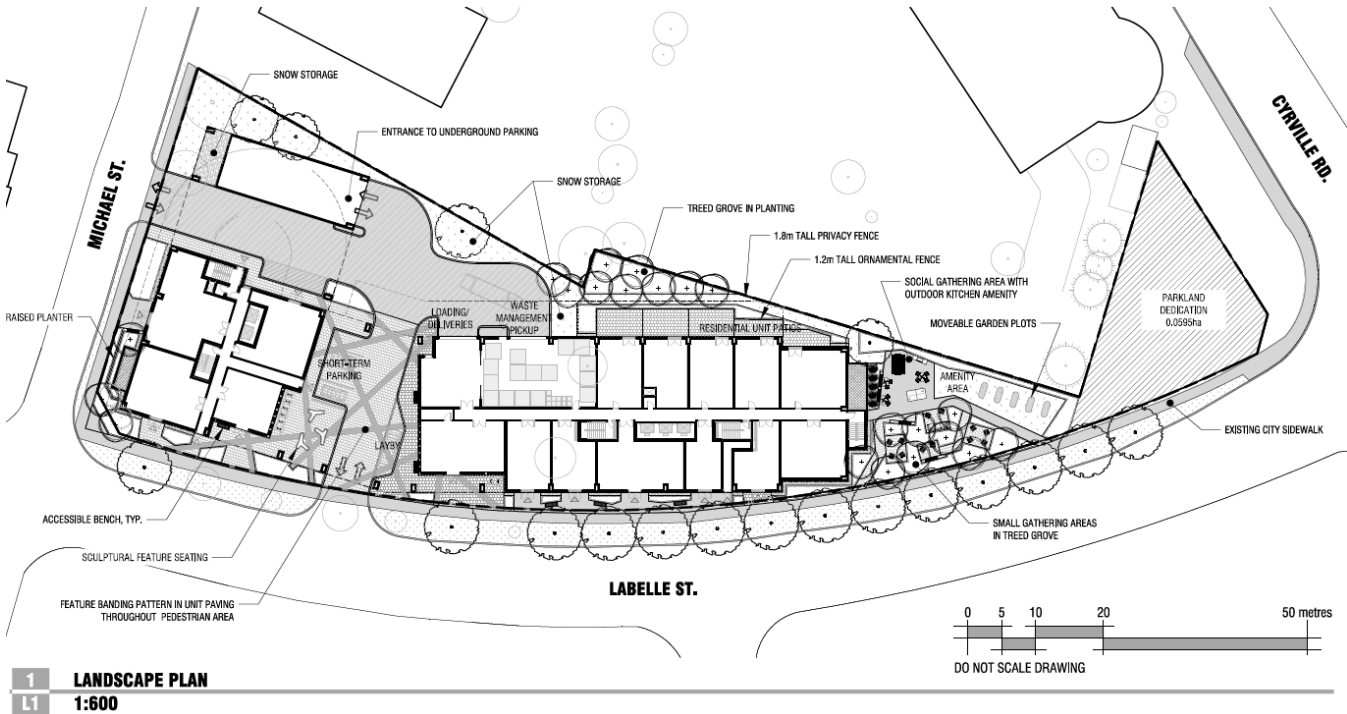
Excerpt from Landscape Plan (Source: Fotenn Planning + Design)
